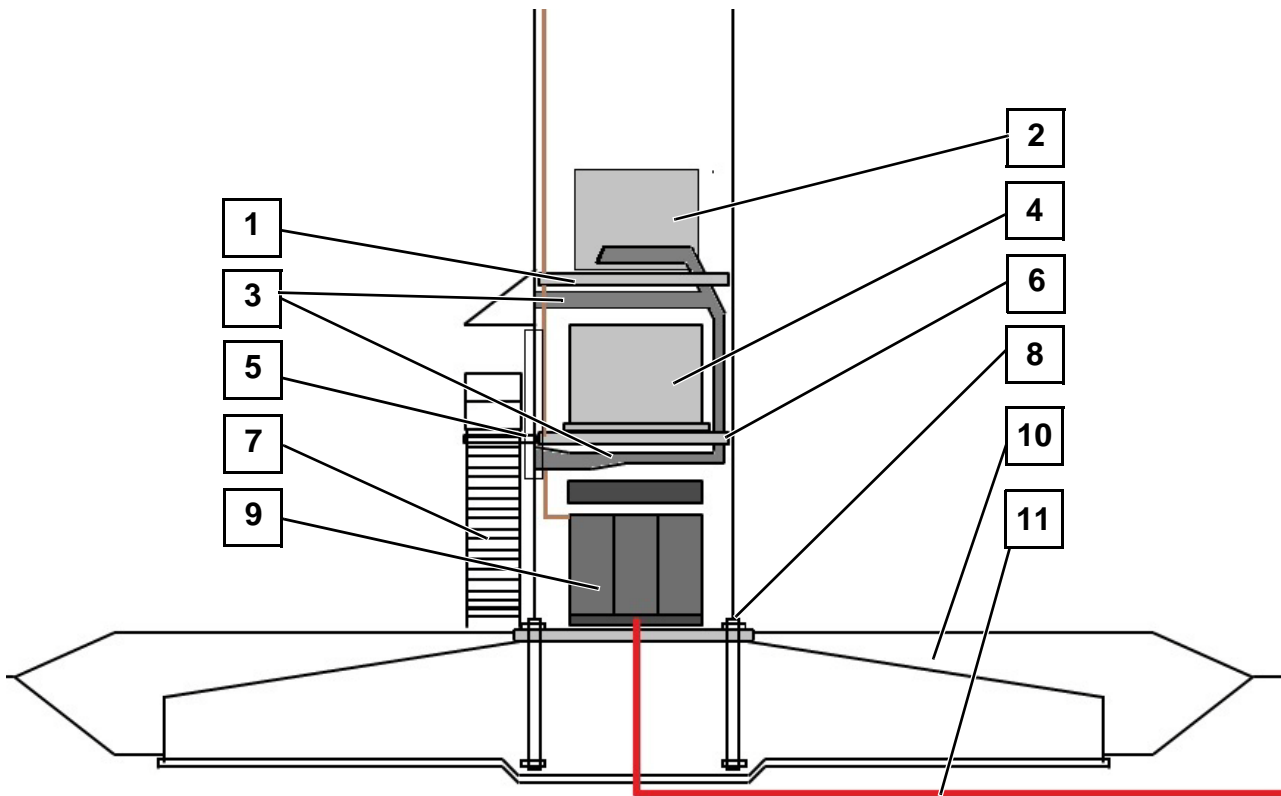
Sectional view of the tower base, variant with transformer inside tower (TIT)
